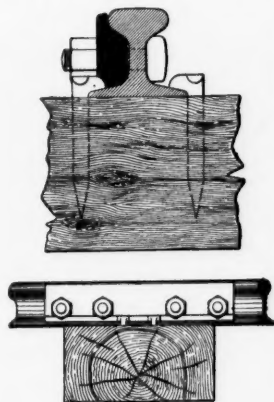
Rail Joint with Single Splice Bar; Copenhagen-Roskilde Line, 1847.
